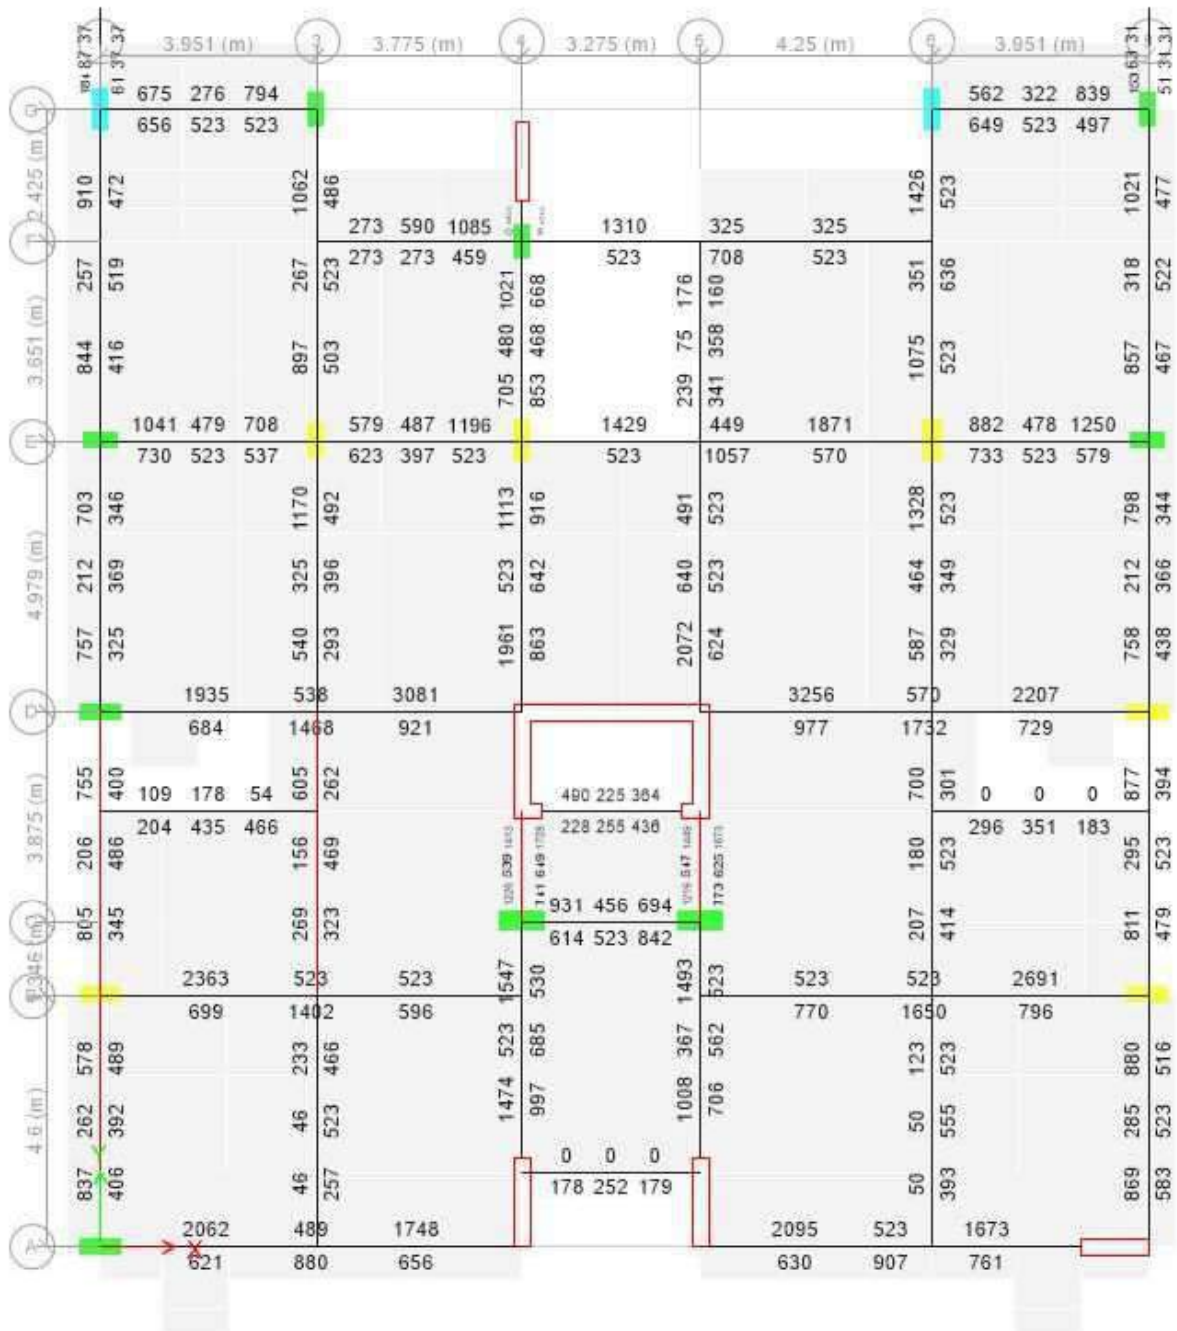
Reinforcement of 7th Floor Beam (mm²)
